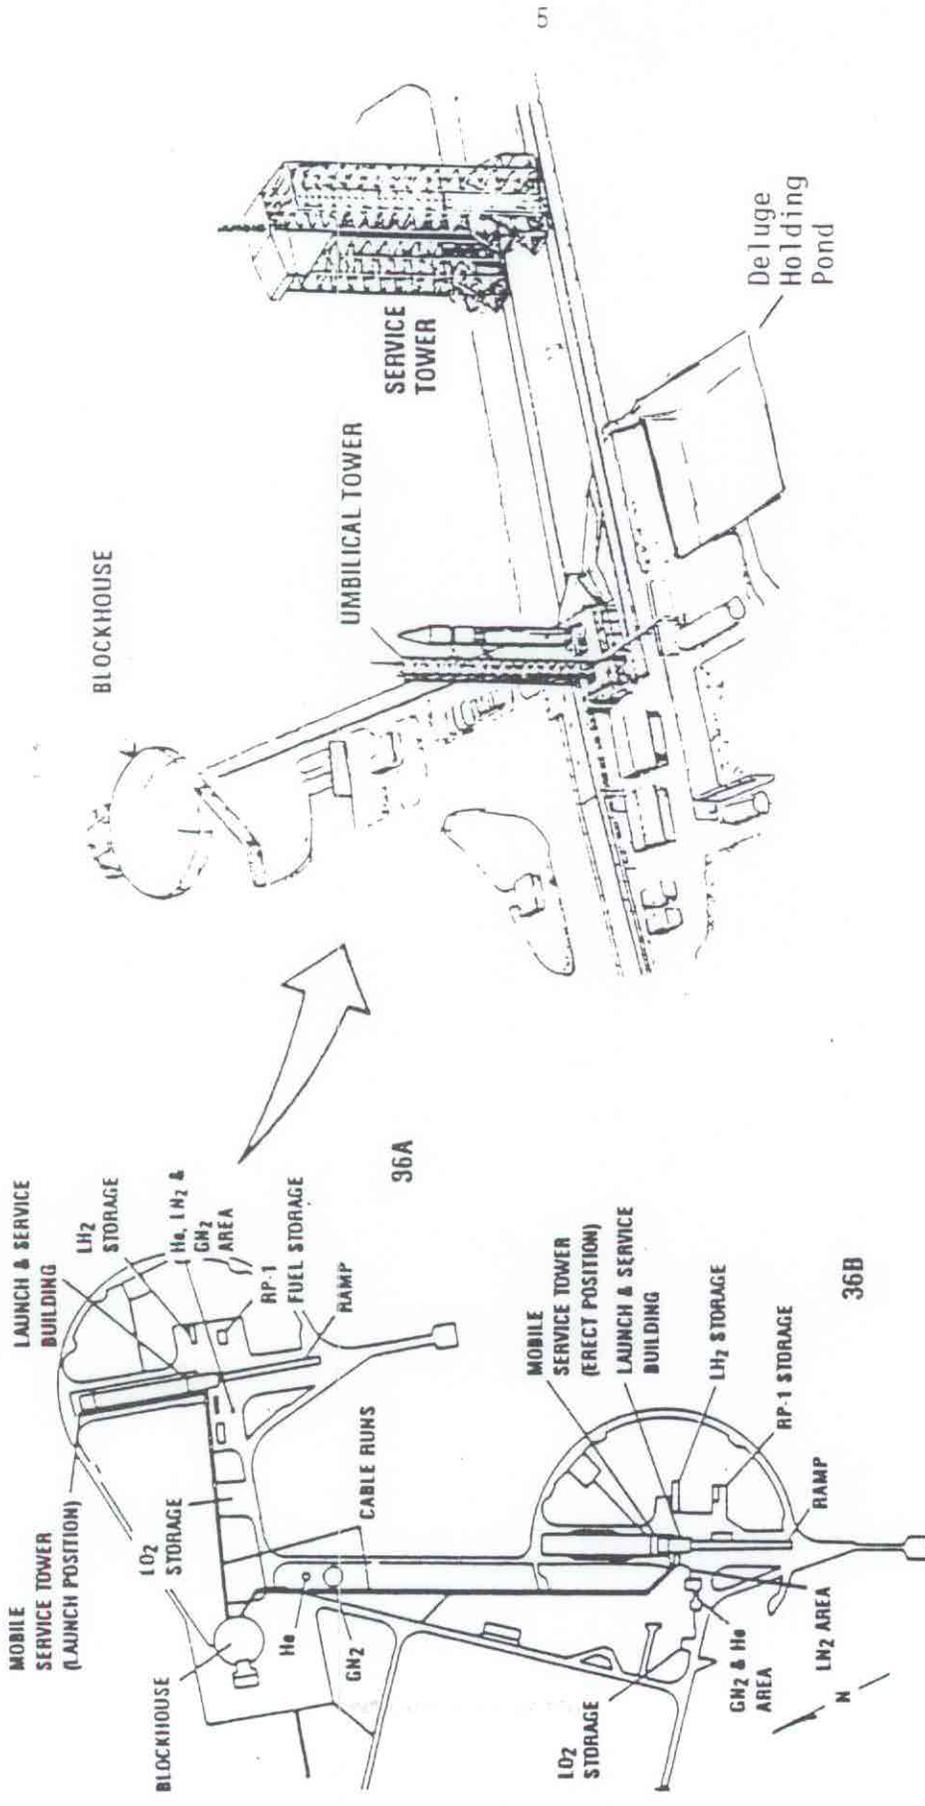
Layout of space launch complexes A and B at Cape Canaveral Air Force Station, Florida.
